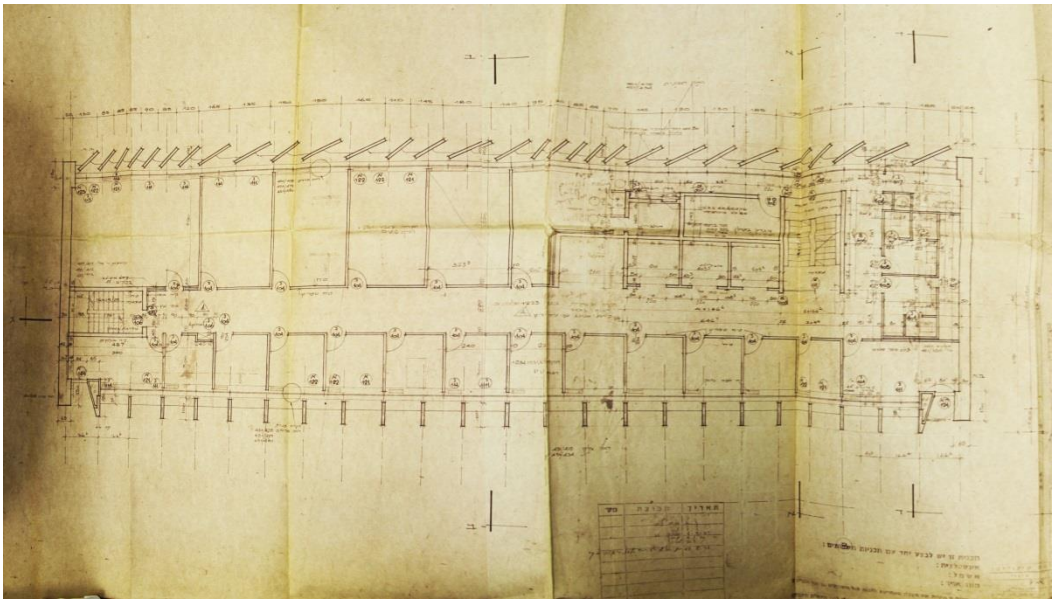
Early typical floor plan of the Eshkol Tower, unsigned, dated from 6.2.1968 (University of Haifa Archive, container 0735). On the south-eastern facade a 1.66 m module was applied for the sun breakers. While the same module was applied for the windows of the north-western facade, the vertical diagonal sun breakers were arranged in what seems to be a random modulation
